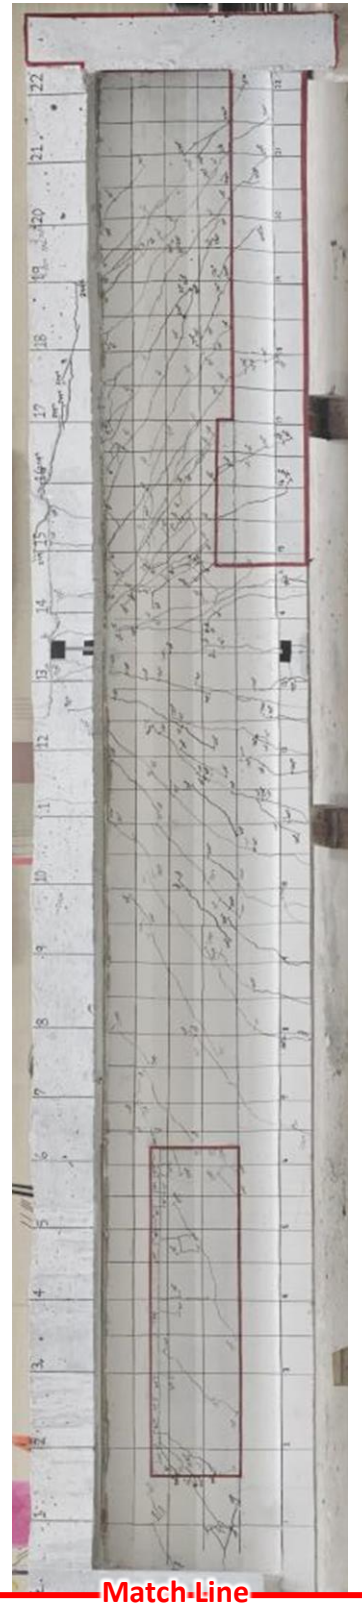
Enlarged West Photographic Elevation From Initial Testing (North End)
